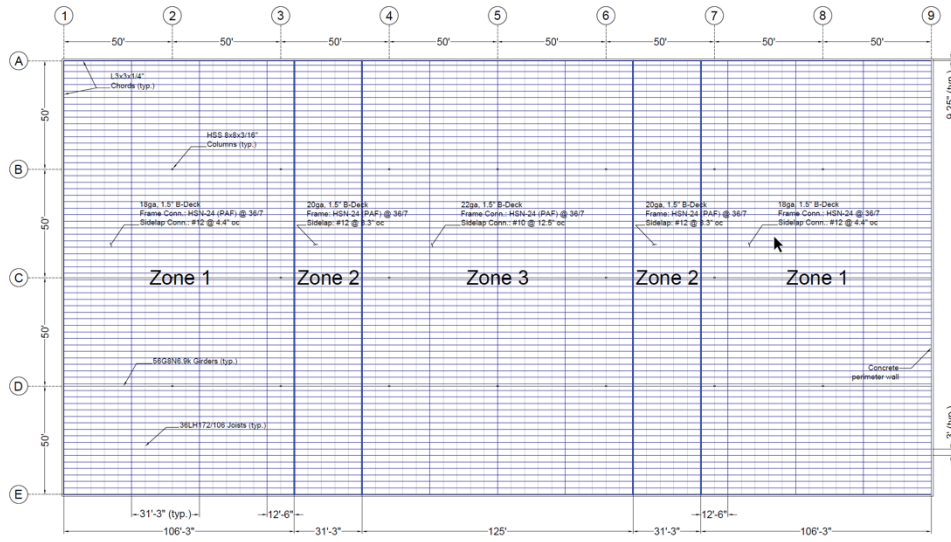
Roof plan view of RWFD steel deck large building archetype (1' = 0.30 m, 1'' = 25.4 mm)
